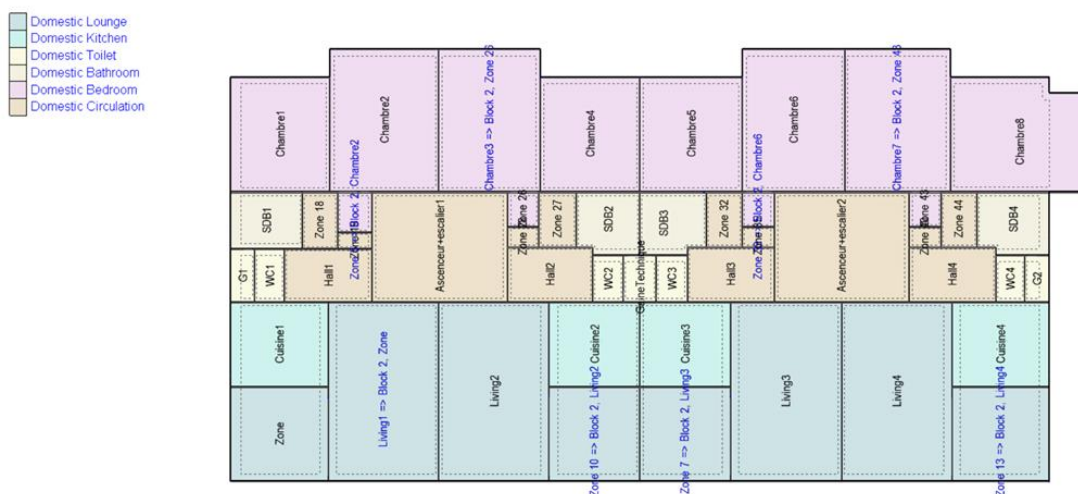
Layout of one apartment building floor used to run the dynamic energy simulations
